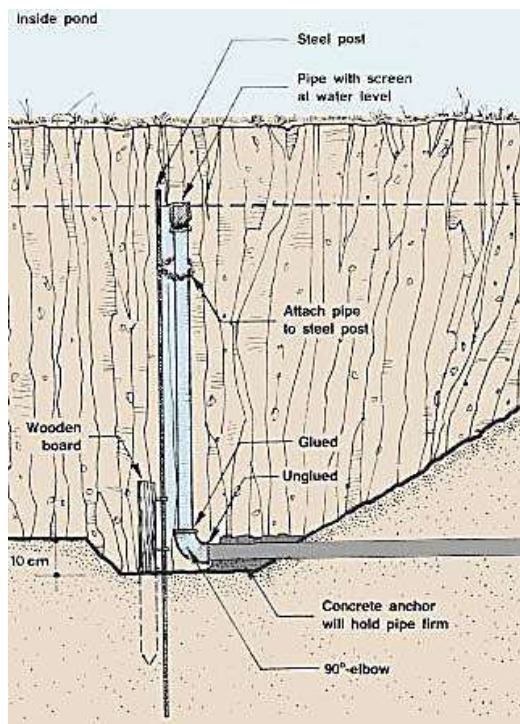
An example of a flashboard-controlled outlet continued, pipe outlet leading from inside pond toward potential outlet on outside of berm (flashboard not pictured; FAO 2020).
